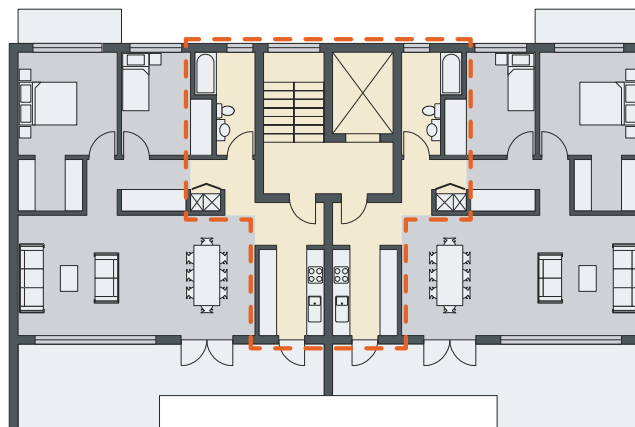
S.2 The building layout should ensure that amenity impacts from noise are reduced to both living areas and bedrooms. The plan above locates living spaces away from the noisy access core
